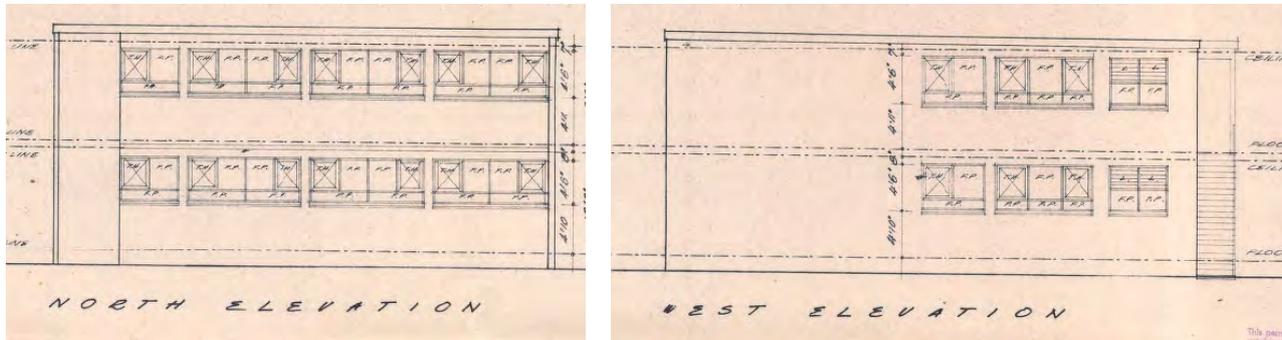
Drawings relating to building permit 57/1612 (K Popper, Oct. 1960). North and west elevations of the proposed new college building. (Source: Council Building File)
